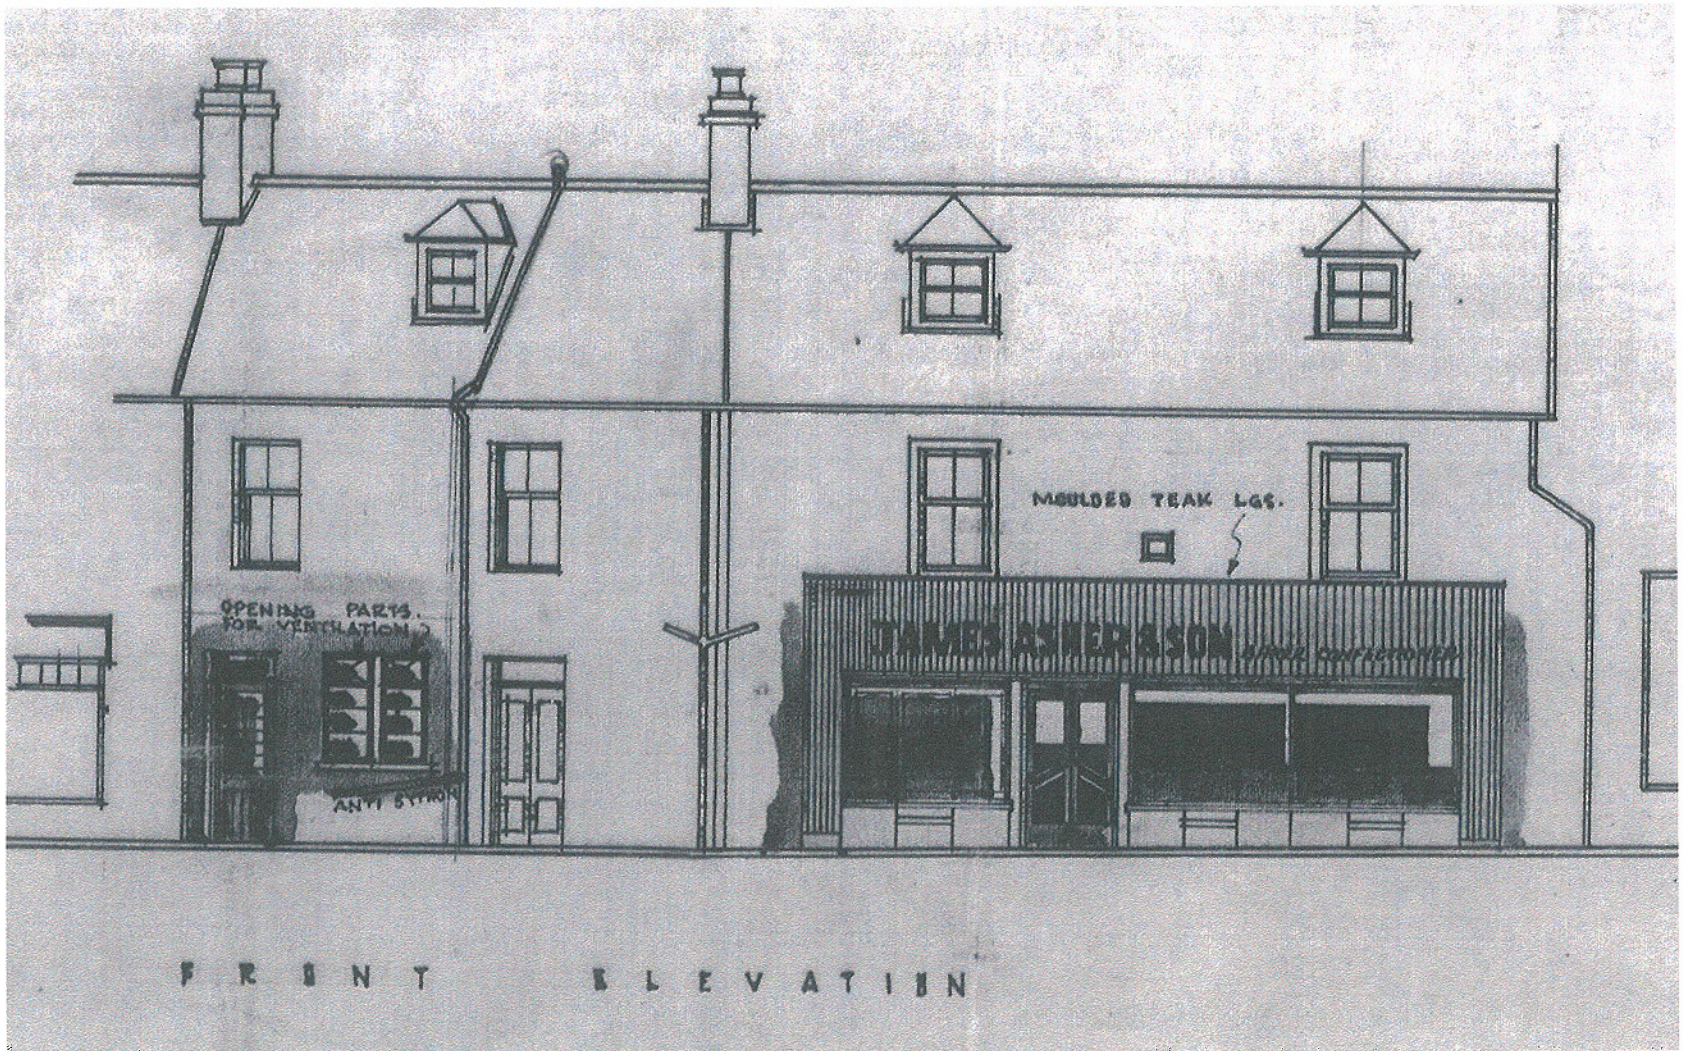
New Front Elevation 1953 scale 1/8" = 1ft.
